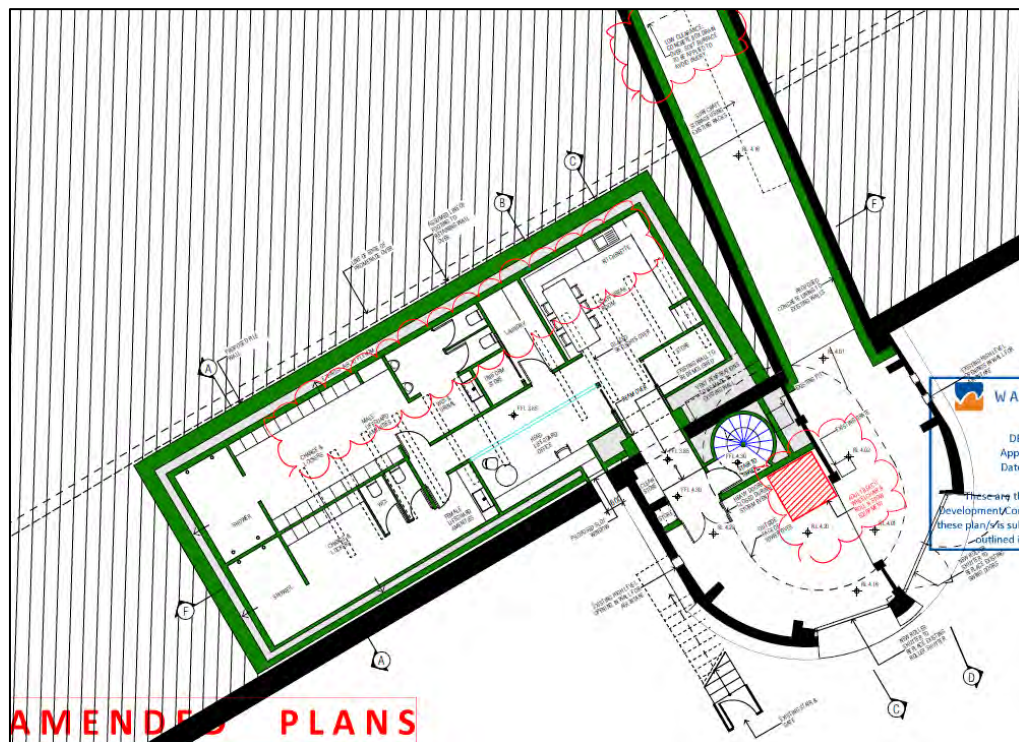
Approved site plan of Lifeguard Tower, Tunnel 2 and Amenities block.
